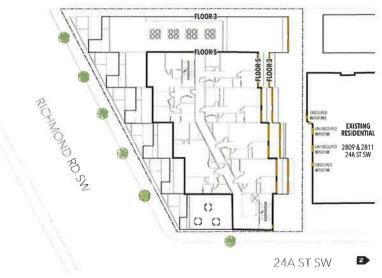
GROUND FLOOR PLAN | GROUND FLOOR WINDOWS
